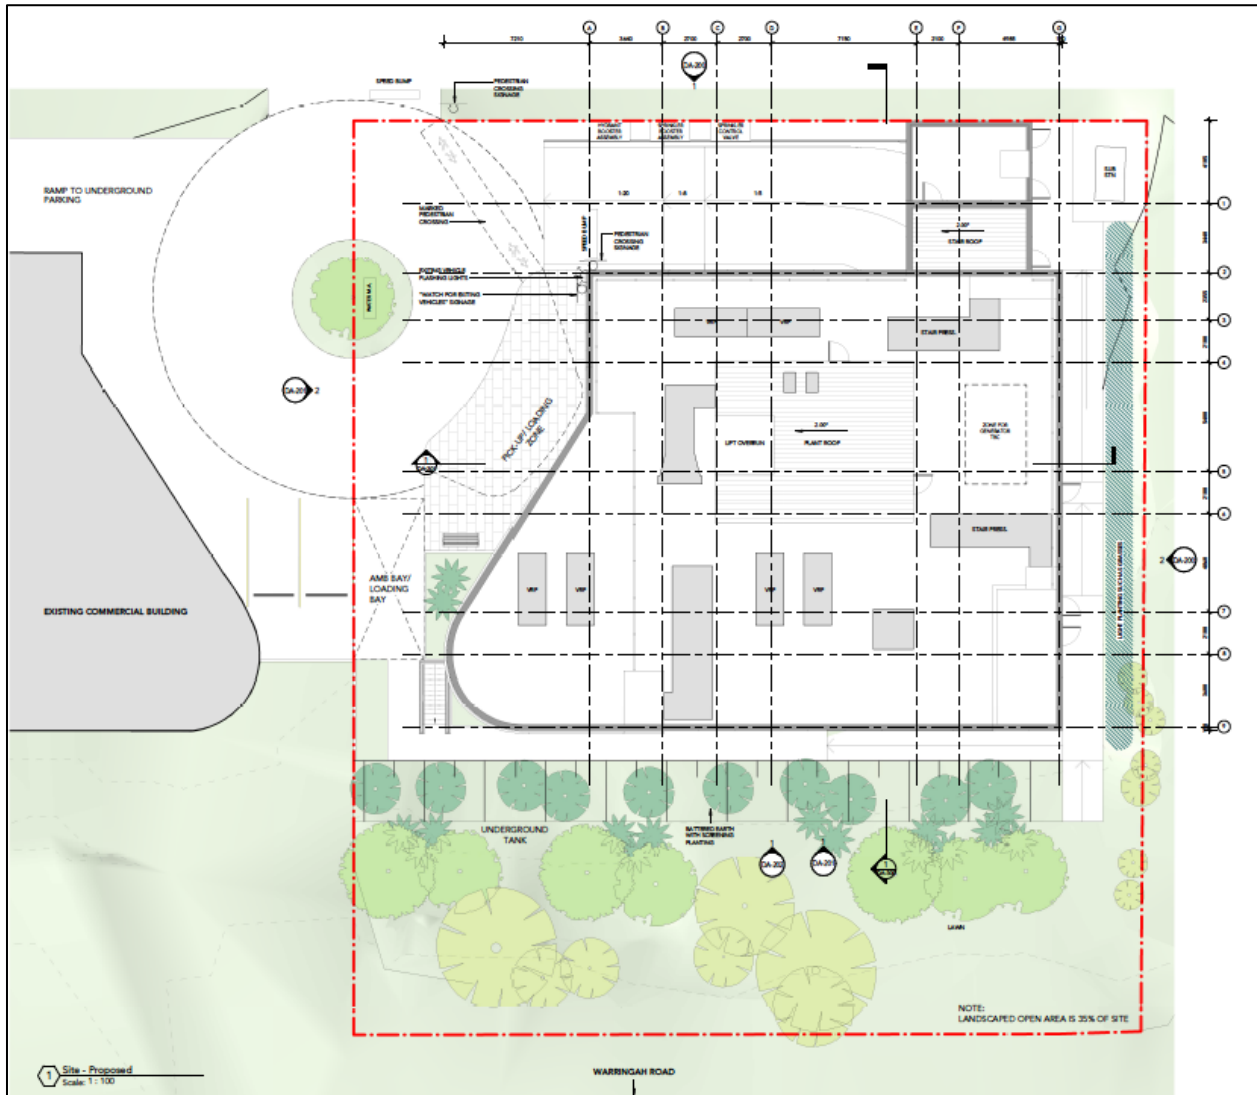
Proposed Site Layout (Team 2 Architects 2019)
